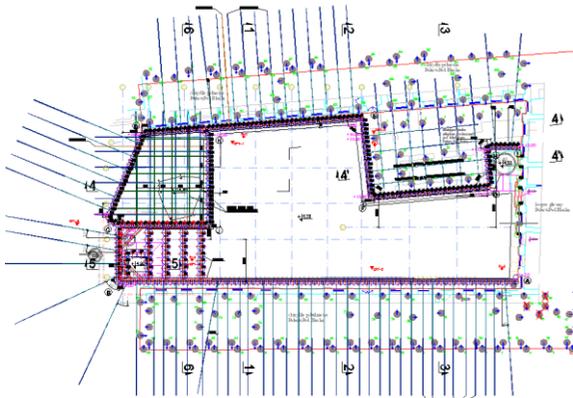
Excavation layout, lateral support system and tieback anchoring scheme
